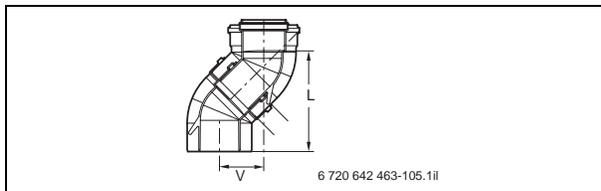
Offset dimensions, concentric bend Ø 80/125 (dim. → tab. 90)
